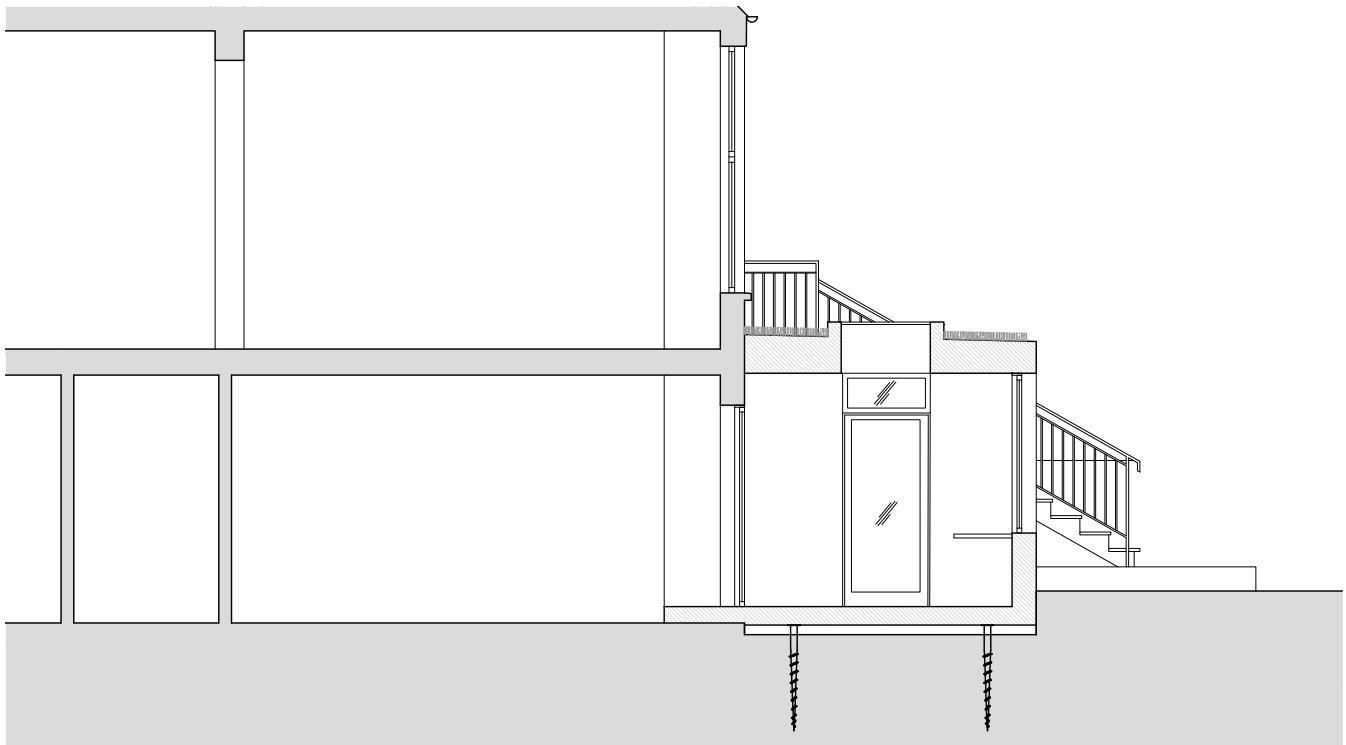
Proposed section showing ground screw foundations (not to scale)
